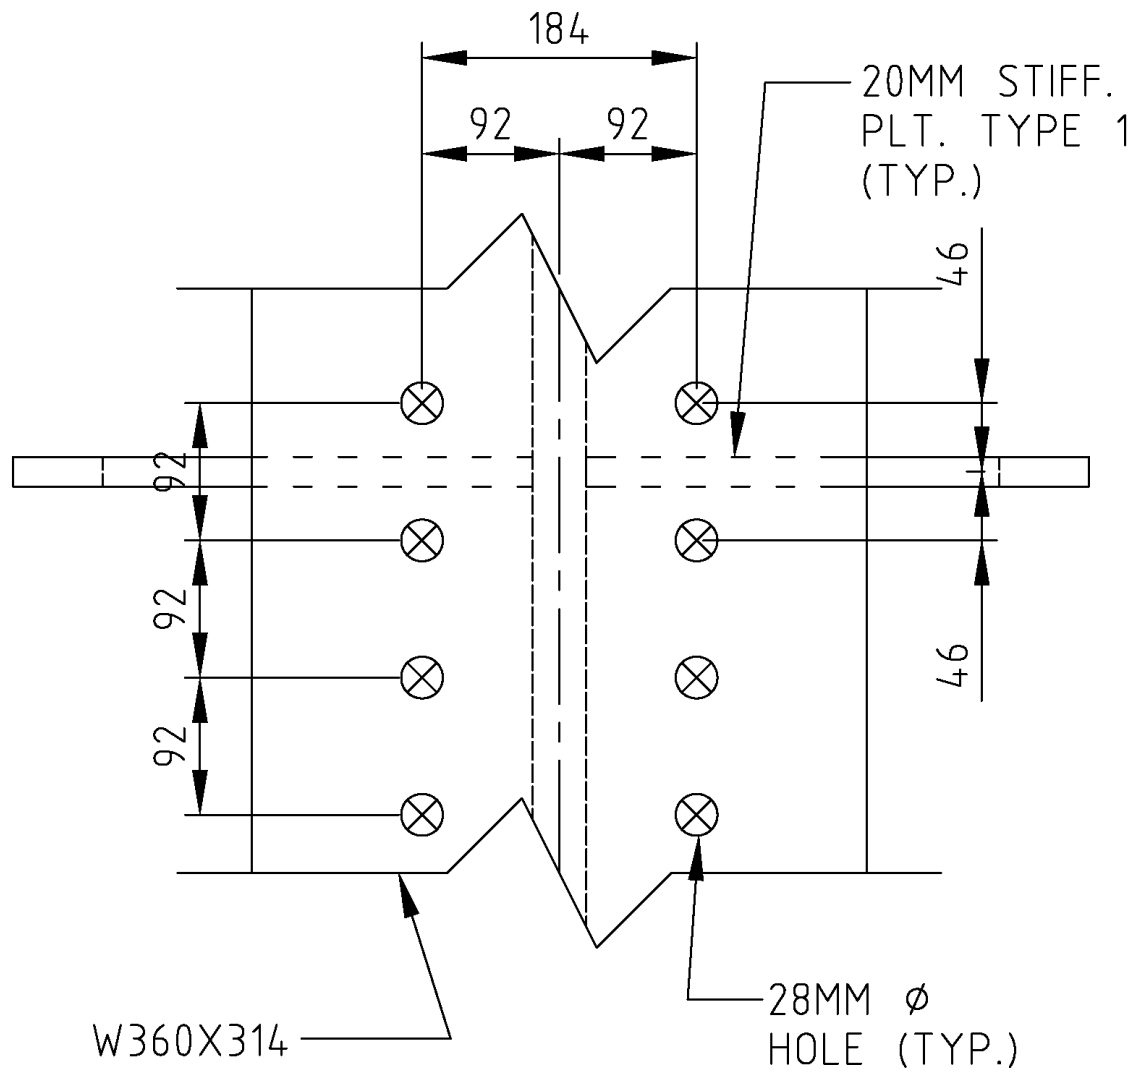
Wall mount loading system design and fabrication drawing – Drawing 16.
